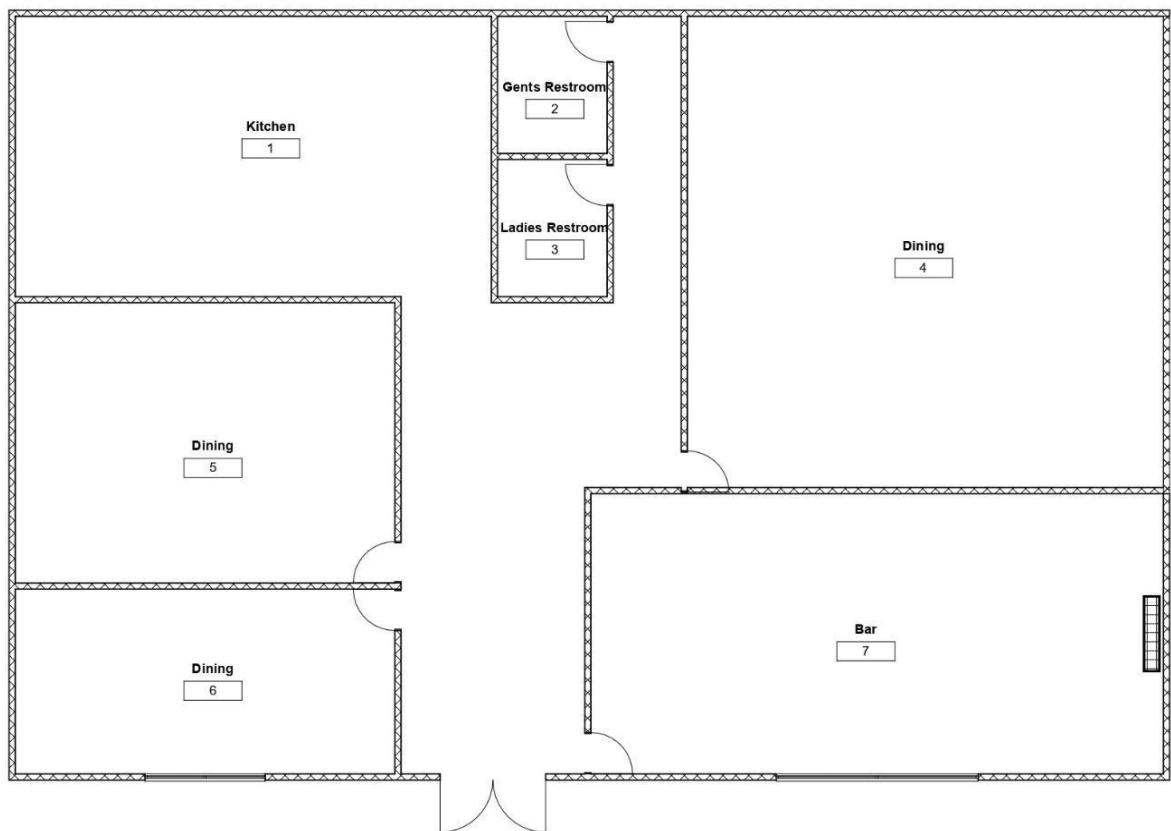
The building Floor plan, indicating the various rooms is shown below.
